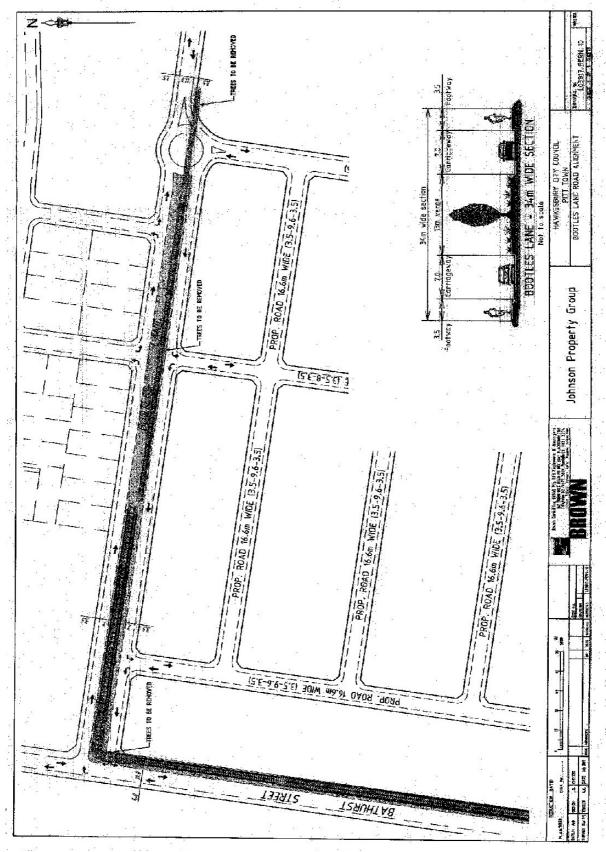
a: Bootles Lane Design Concept - 34m Wide Section
